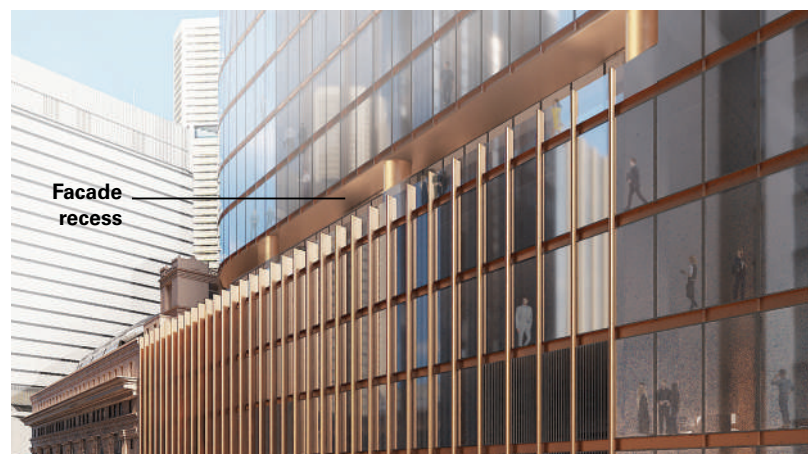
Detail of facade recess and series of tapering vertical fins transitioning the design from a street wall to tower to ground form
